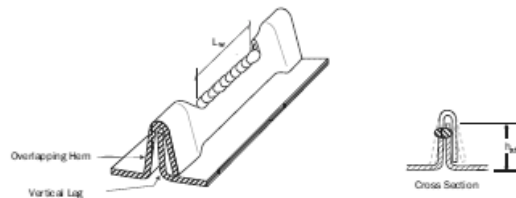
Top Seam Weld - Vertical Leg and Overlapping Hem Joint
